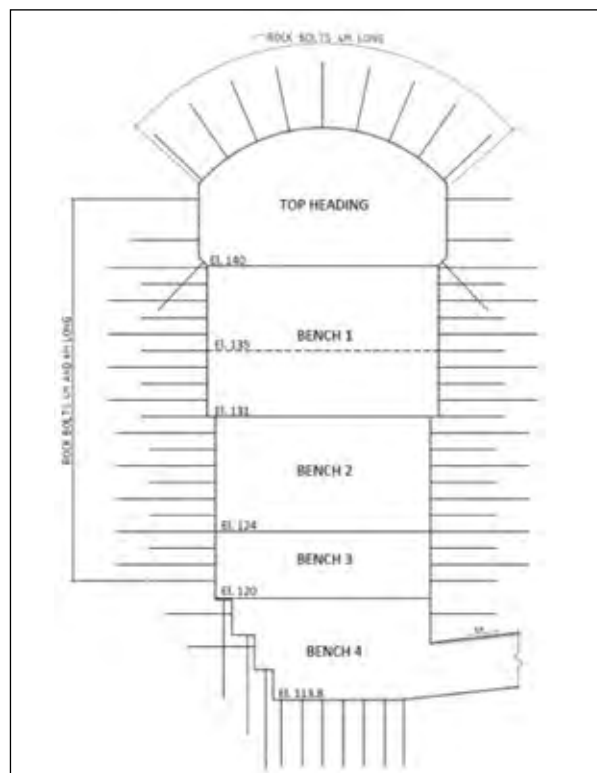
shows principle installed rock bolts in power station cavern and stages of excavation.
